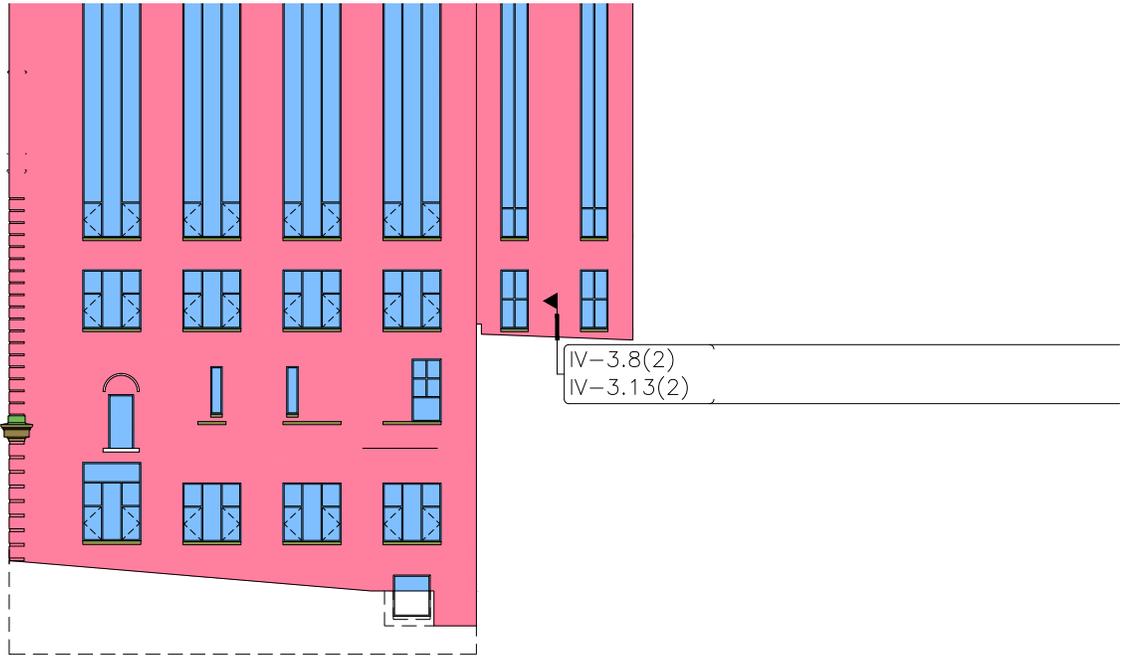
(4): North Courtyard: West-Facing Wall
